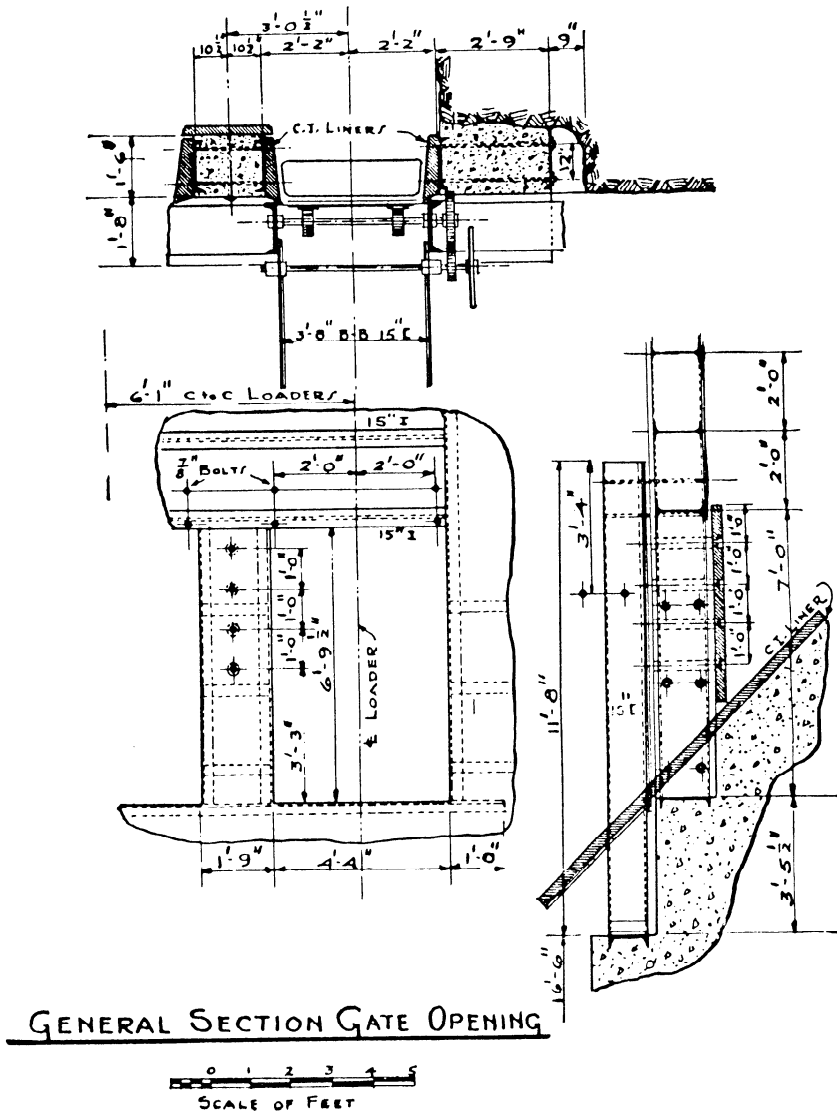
Typical drawing from *Mine Plant* (used by permission of SME-AIME). Detail of gate opening for skip loader, Homestake Mining Co., Lead, SD.
